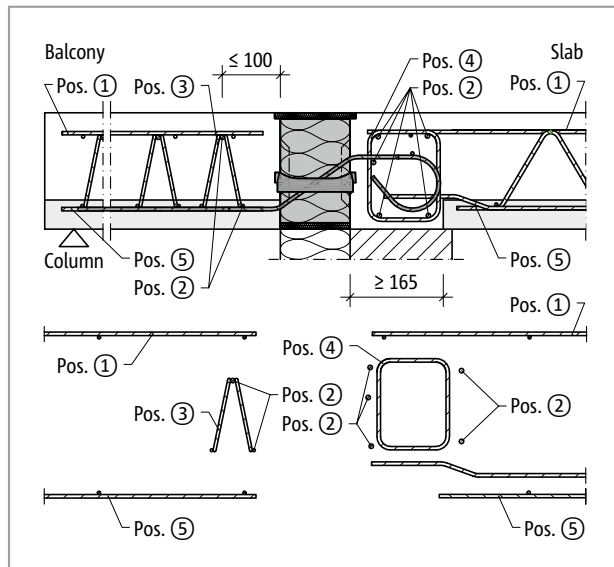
Schöck Isokorb® XT type Q-V1 to V4 on-site reinforcement with lattice beam
